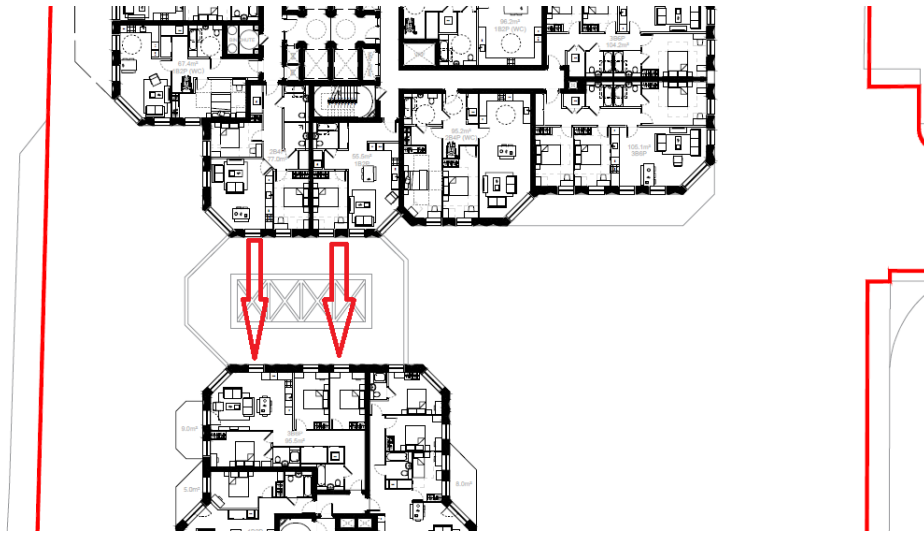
window alignment between the tower and mansion block from 1st to 7th floors
